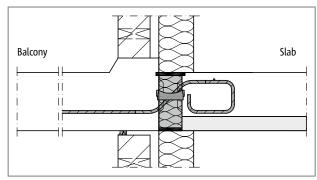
Schöck Isokorb® T type Q-E-W-V: Point connection
